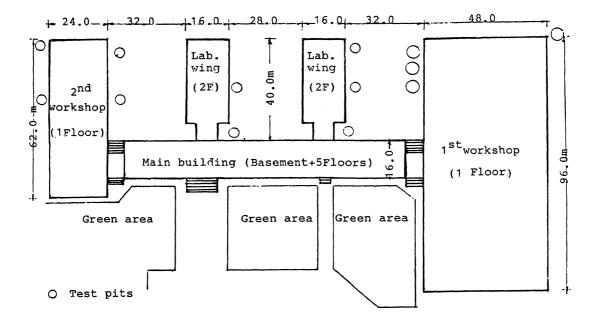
Layout of Building Under Investigation and Test Pits Locations.
